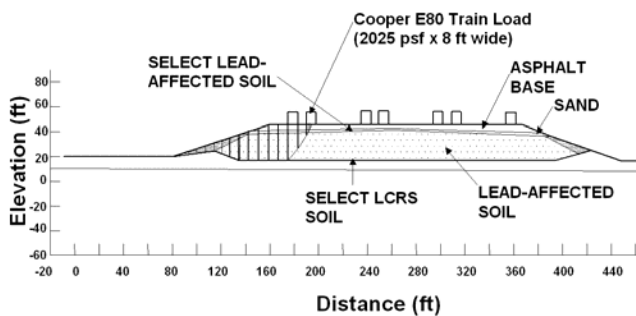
Typical berm cross section used for post ground improvement evaluation of static and seismic stability.
